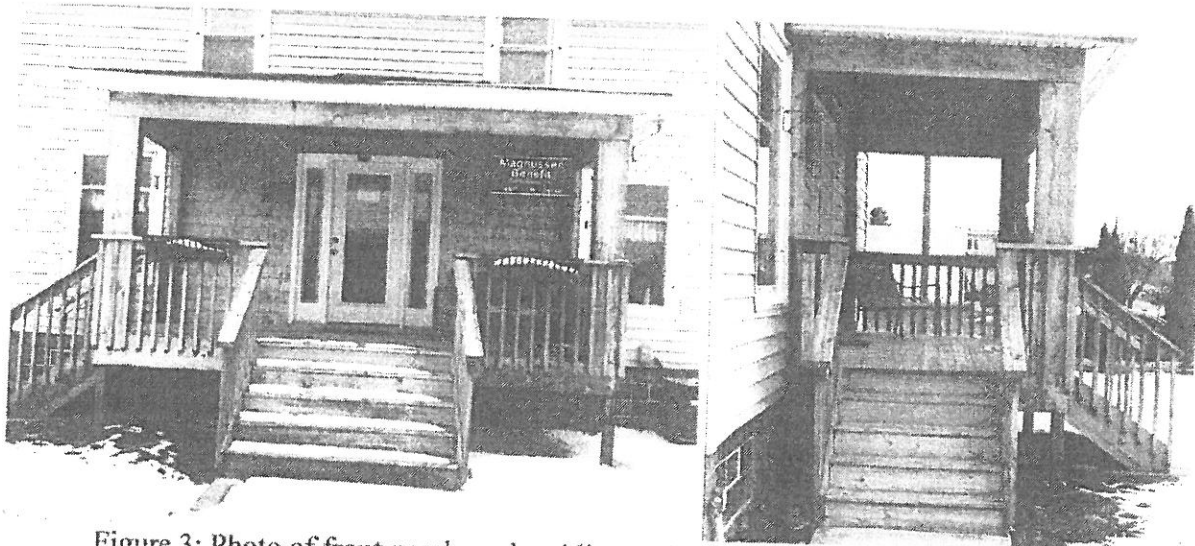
Photo of front porch, cedar siding and stairs for proposed painting work.
